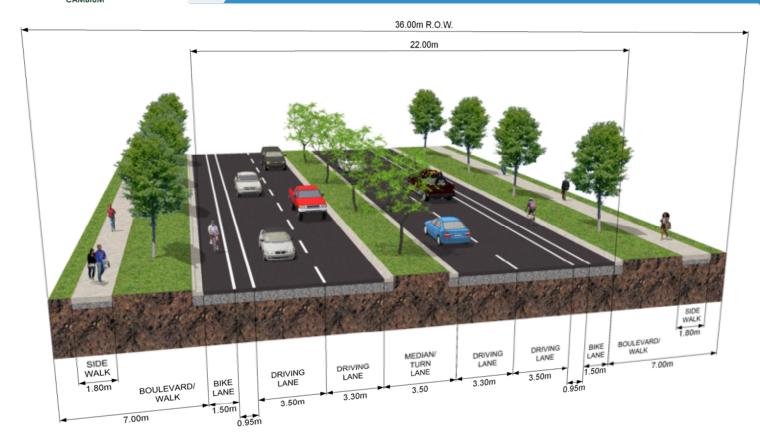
Potential Future Urban Cross Section – New Roads
